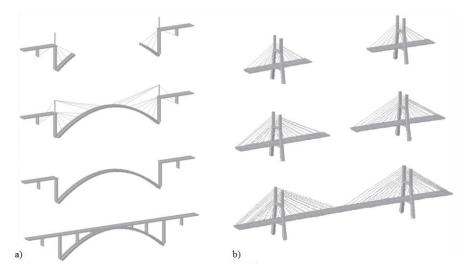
Examples of cantilever construction stages: a) arch bridge, b) cable-stayed bridge
